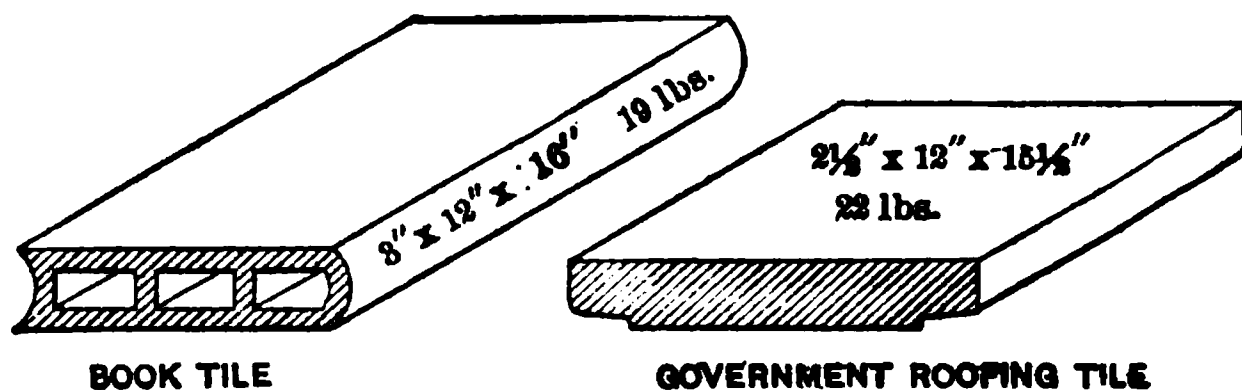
Hollow Book Tile and Solid Tile for Roofs
